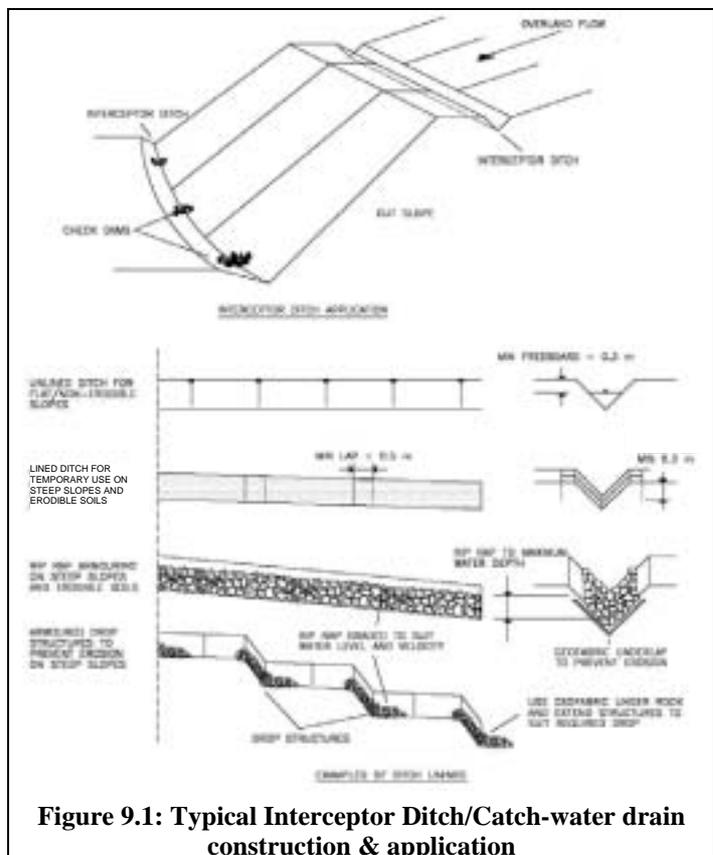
Typical Interceptor Ditch/Catch-water drain construction & application
